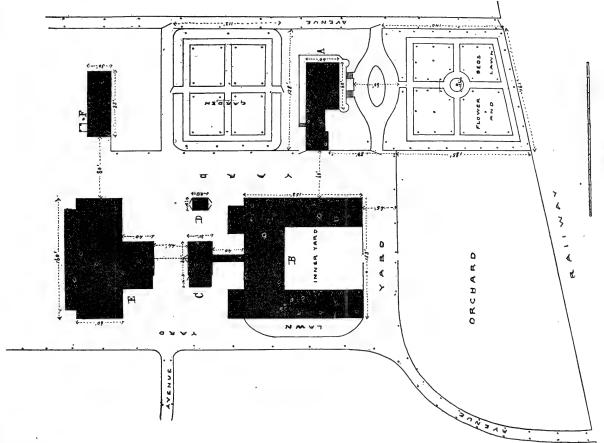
Reford Farm.—General plan of buildings, gardens, etc.
